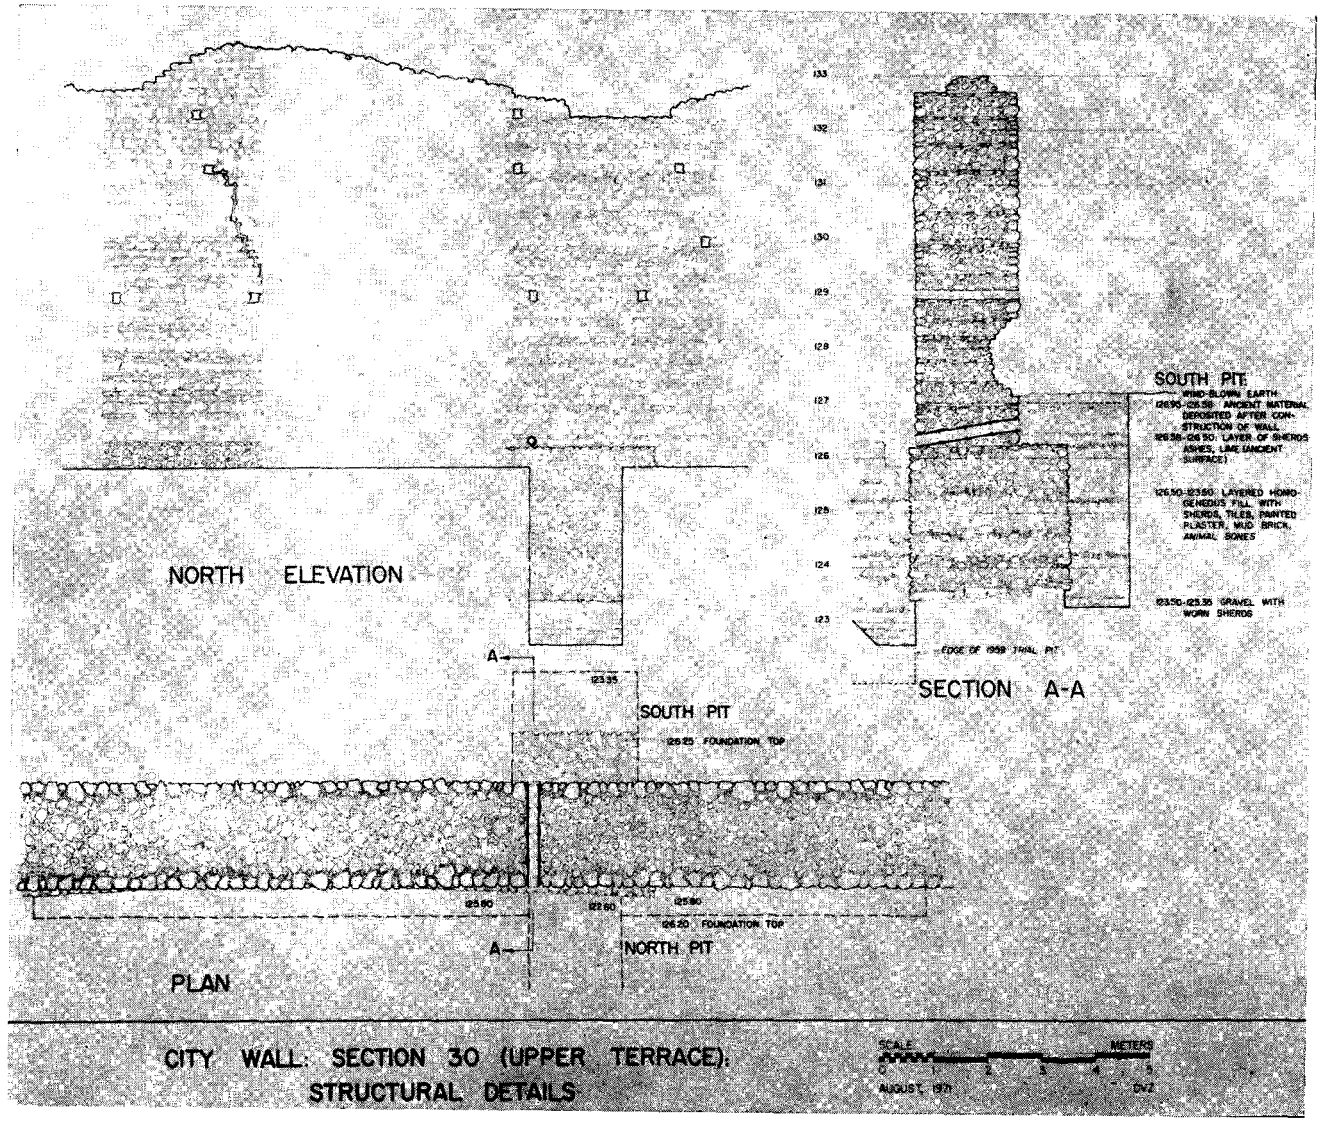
Section through the City Wall. Drawing by D. Van Zanten.
